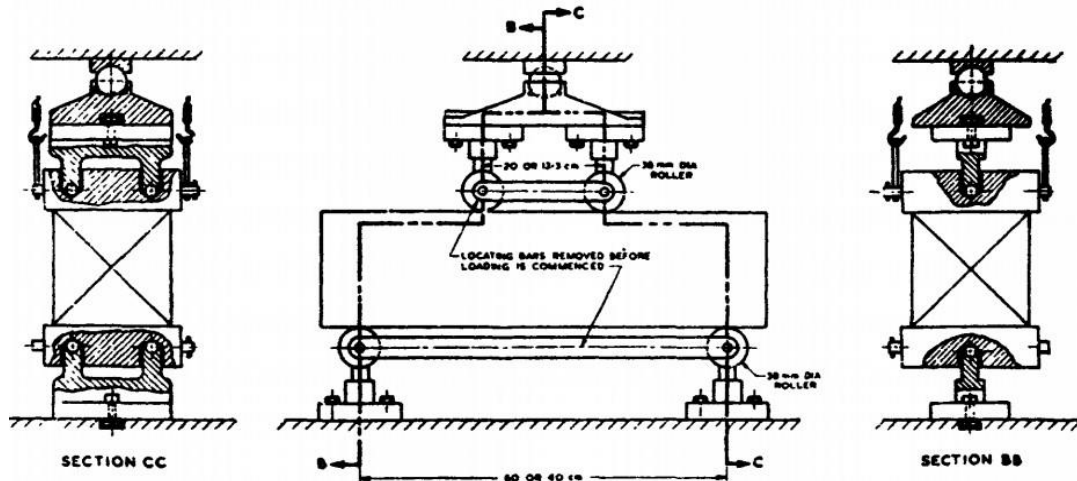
ARRANGEMENT FOR LOADING OF FLEXURE TEST SPECIMEN
